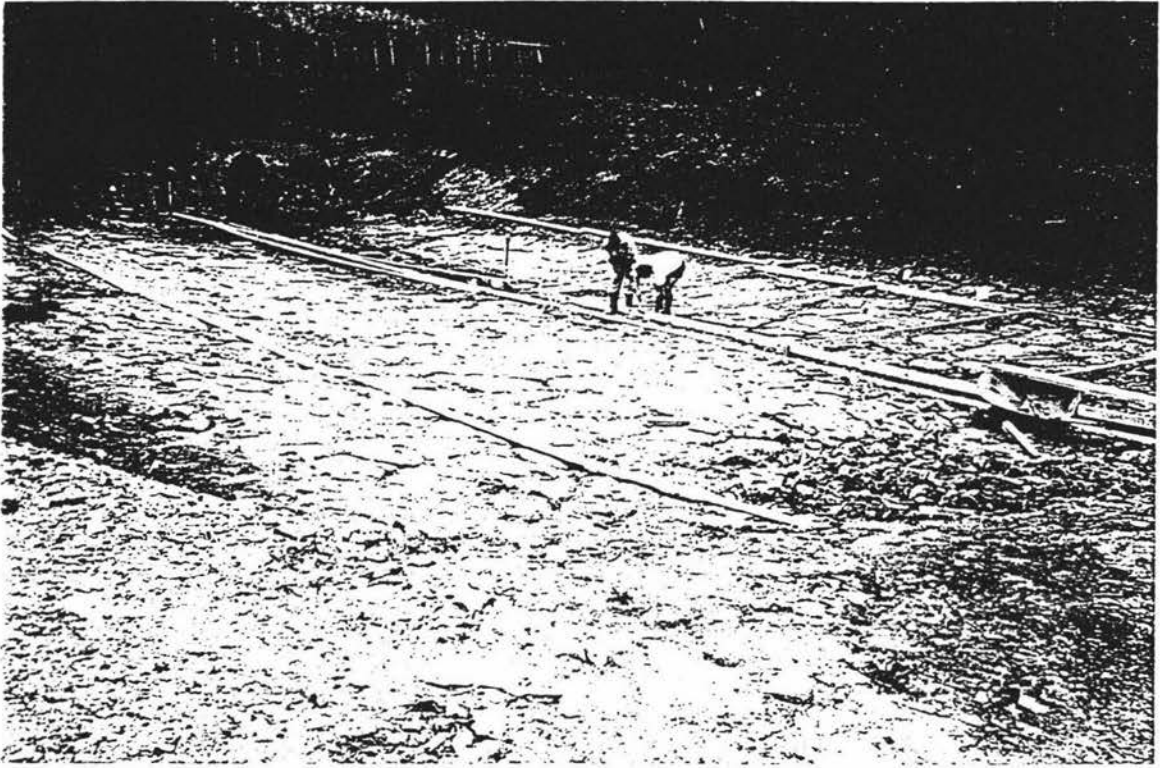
Both Ponds Filled With Tailings. ("Dry" Pond in Foreground).
